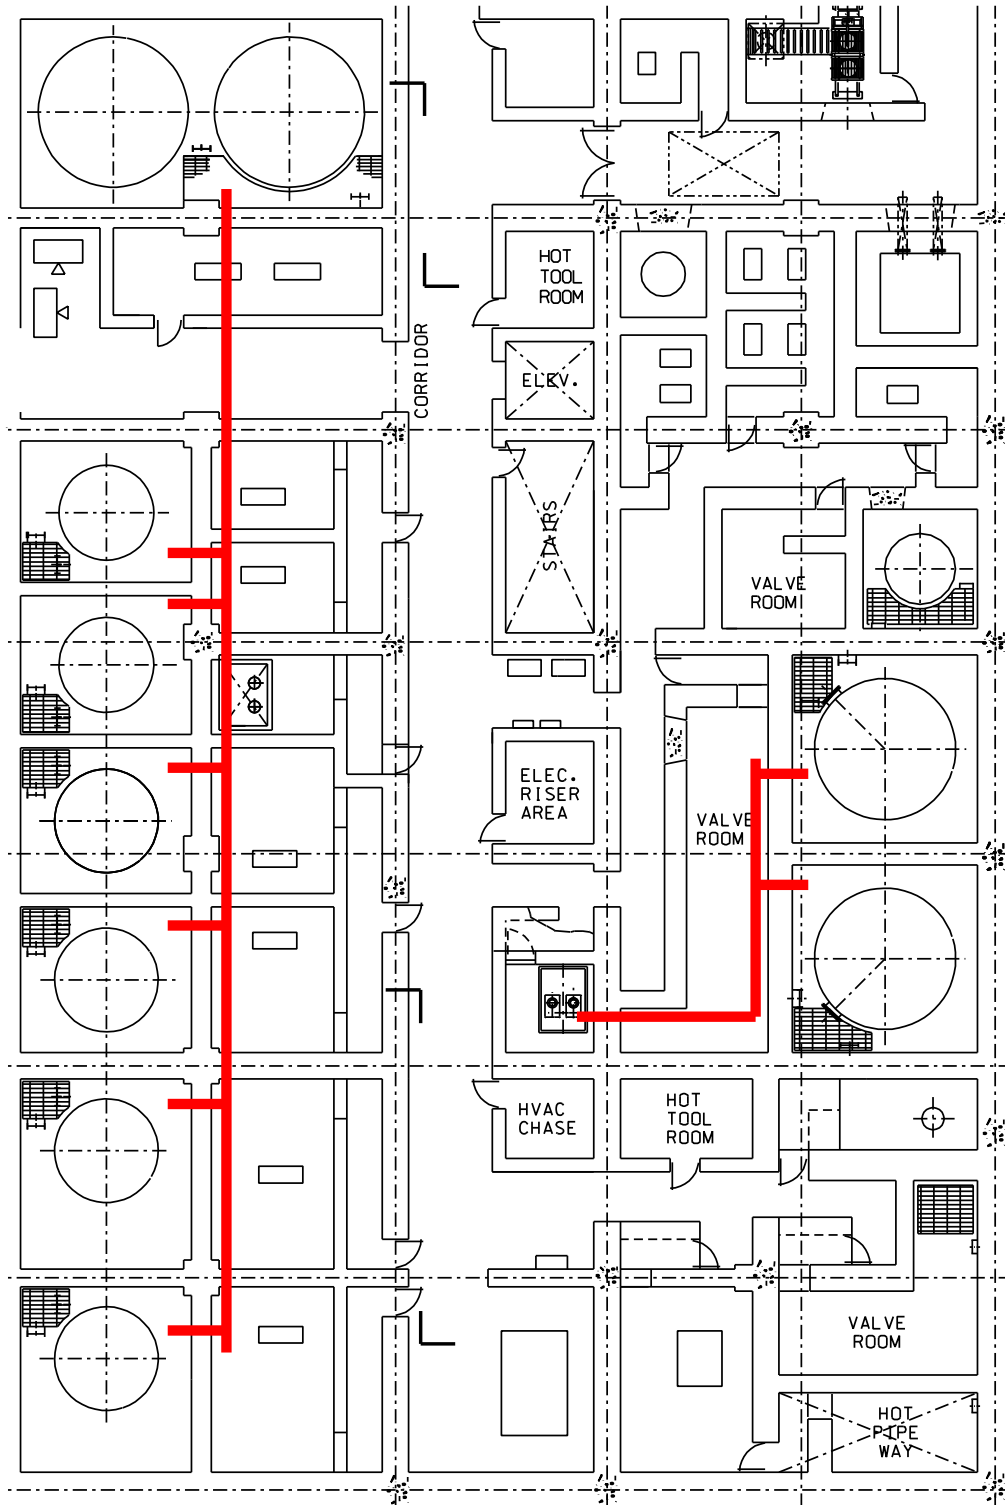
Typical Compound Building Trench Location Schematic
